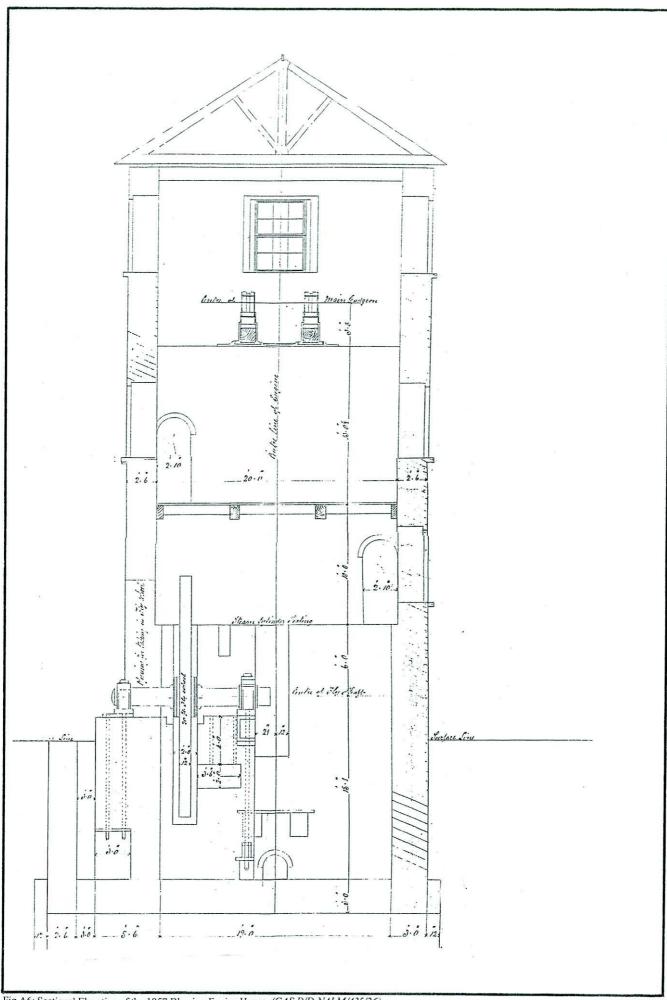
Sectional Elevation of the 1857 Blowing Engine House. (GAS D/D NAI M/435/26)
